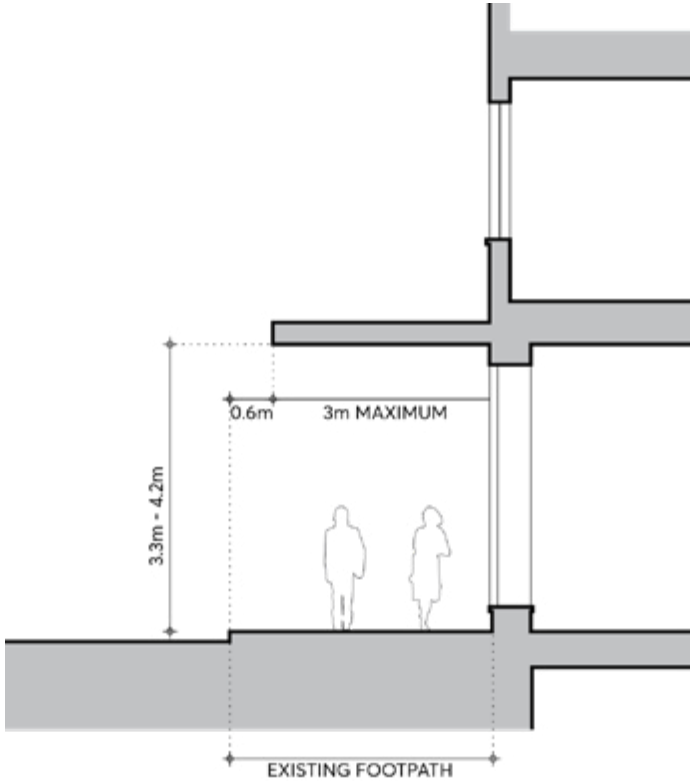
Detailed Section through Macquarie Street
